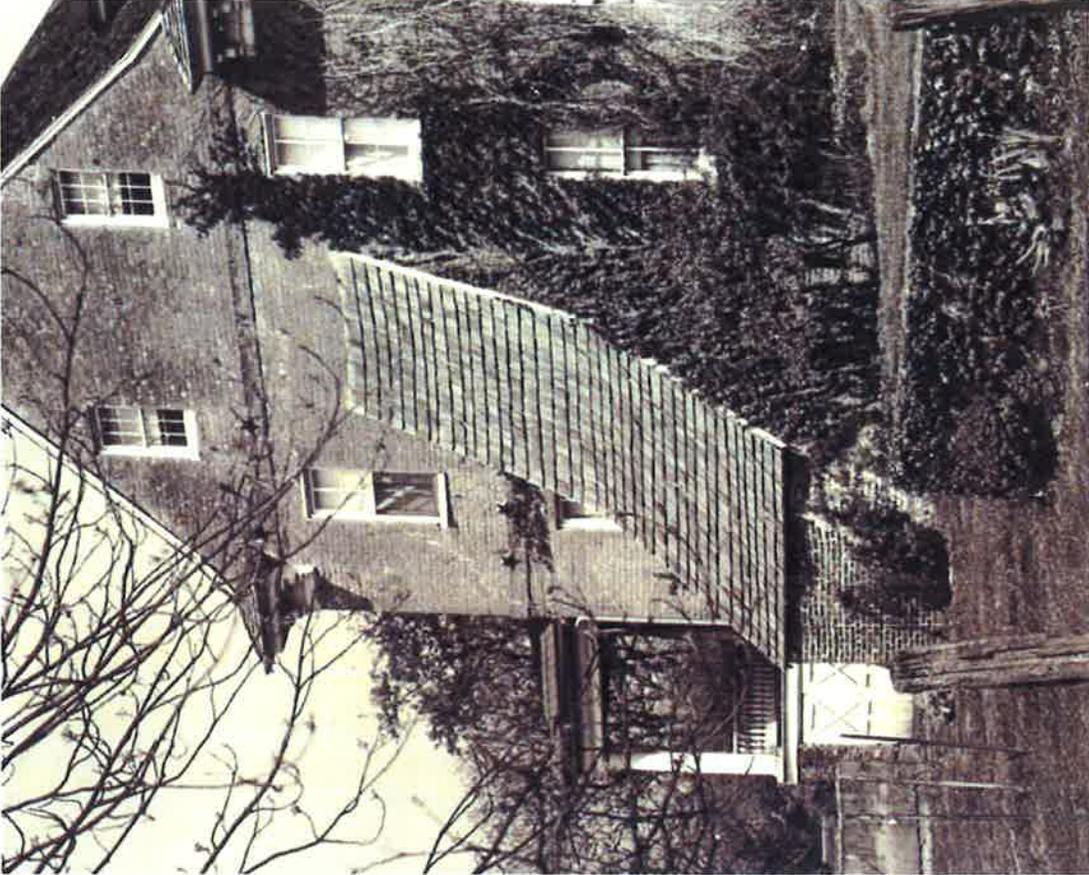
Buttress in 1936 HABS photo. Prior to painting of the entire structure. Note apparent brick damage to southeast corner and dense ivy on east wall.
